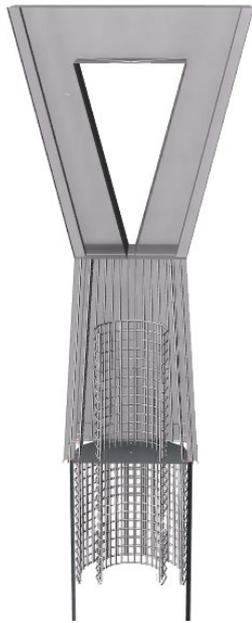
2.5m dia. drilled mono shaft to pier connection
